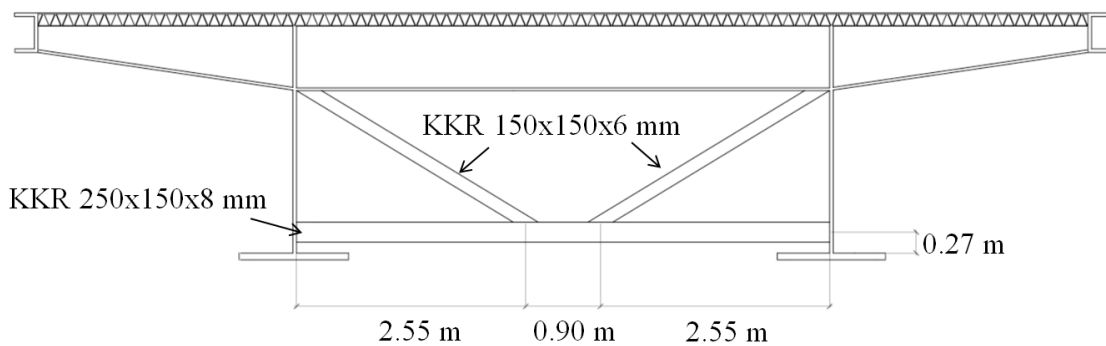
Dimensions of cross bracings in SSD bridge.
